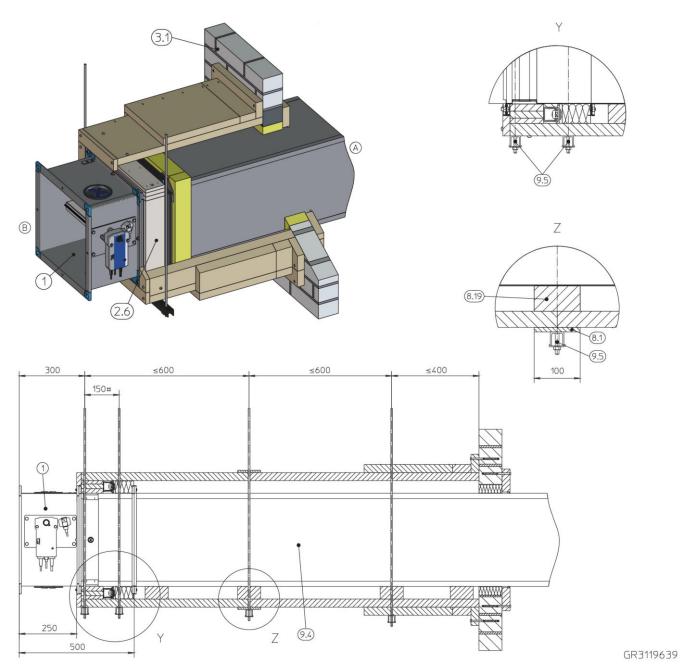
Dry mortarless installation into a solid wall, with installation kit WE
